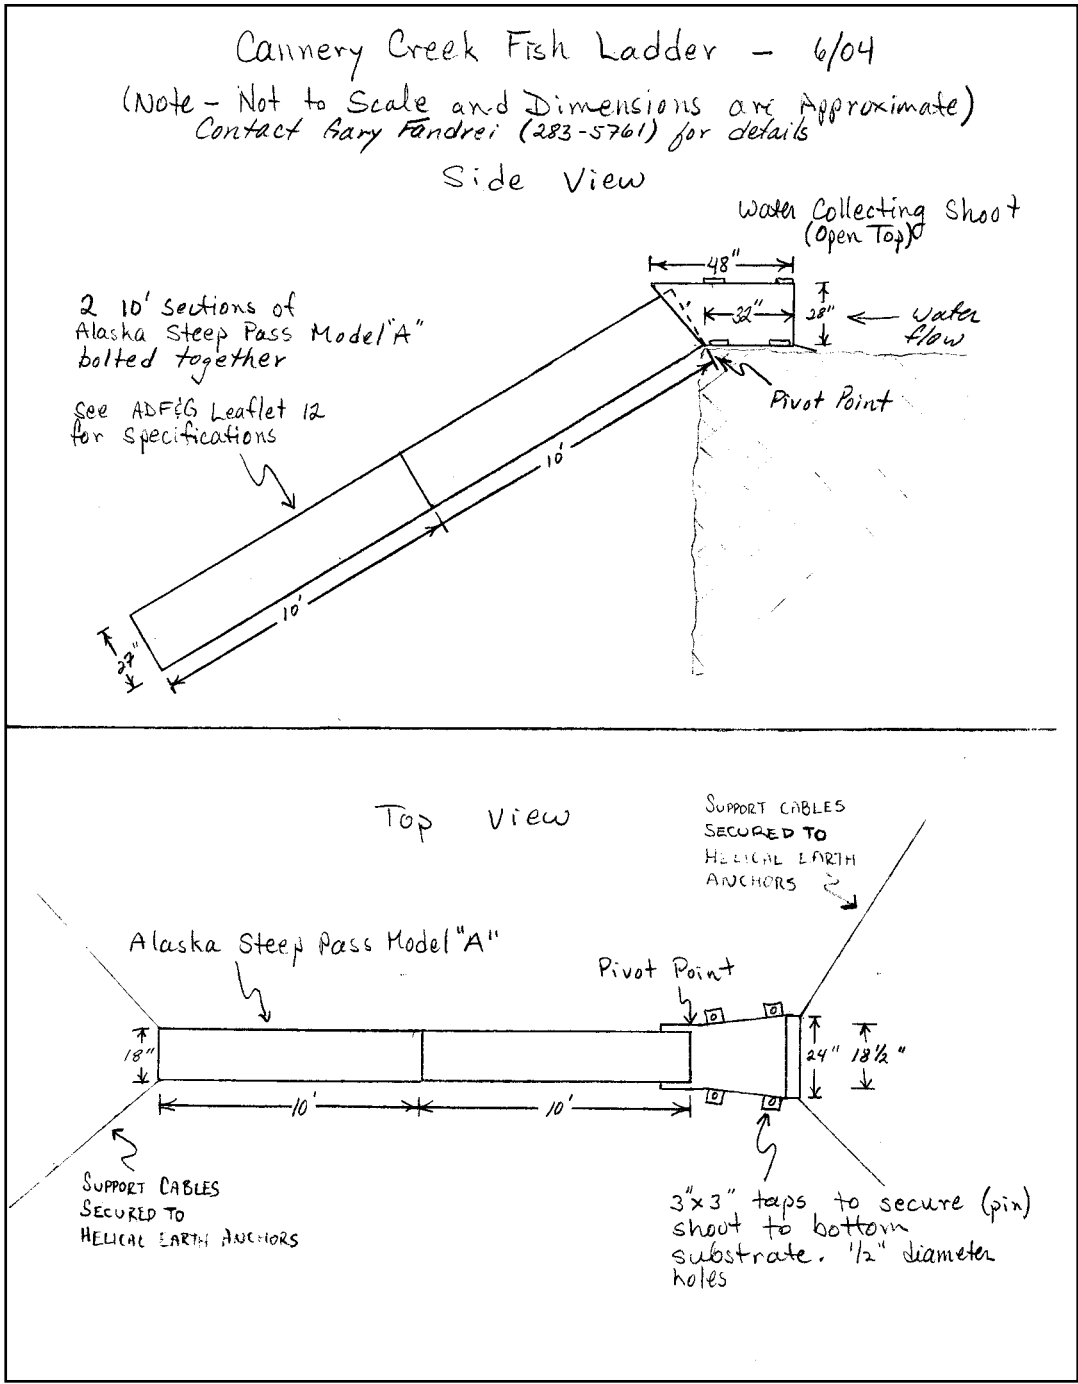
Sketch of Alaska Steeppass used at Cannery Creek. Note that the plans were changed from two 10ft sections to two 8ft sections and one 4ft section.
